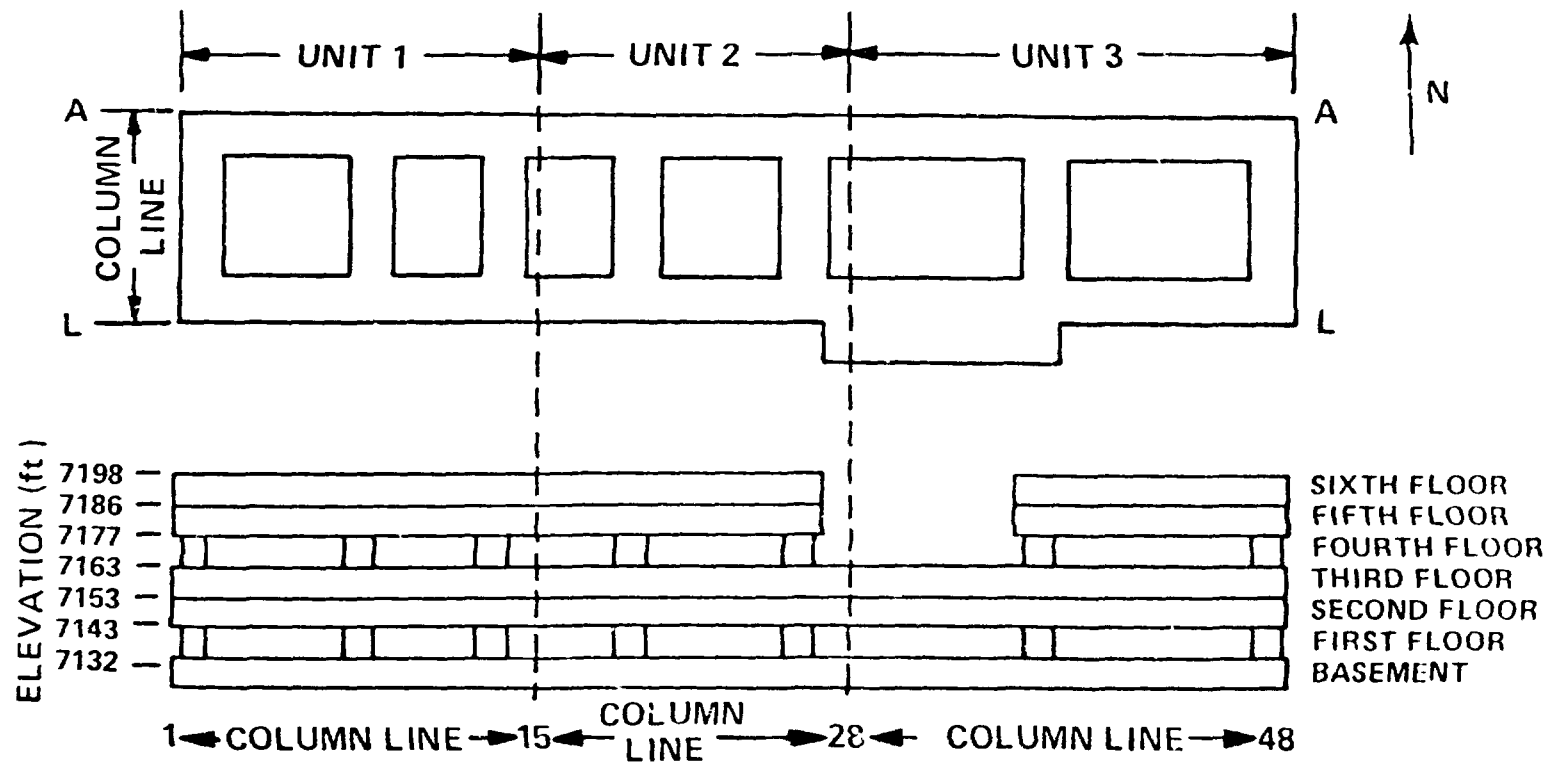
Architectural plan and elevation views of Vandenberg Hall.
